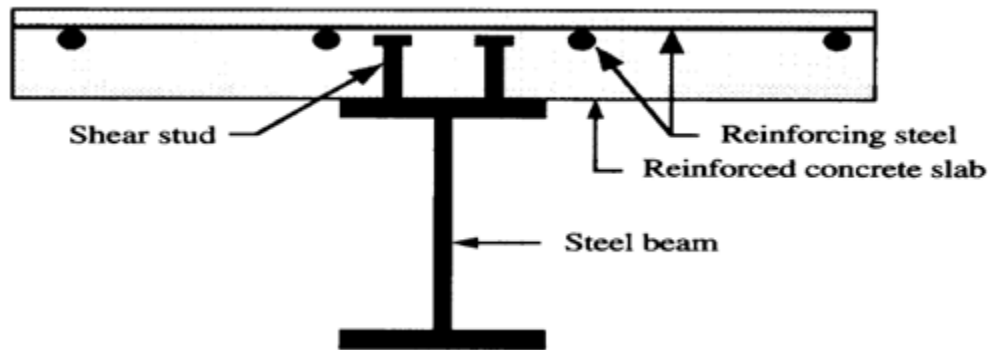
Steel beam with and supporting a concrete slab (*IS 11384-1985*)
